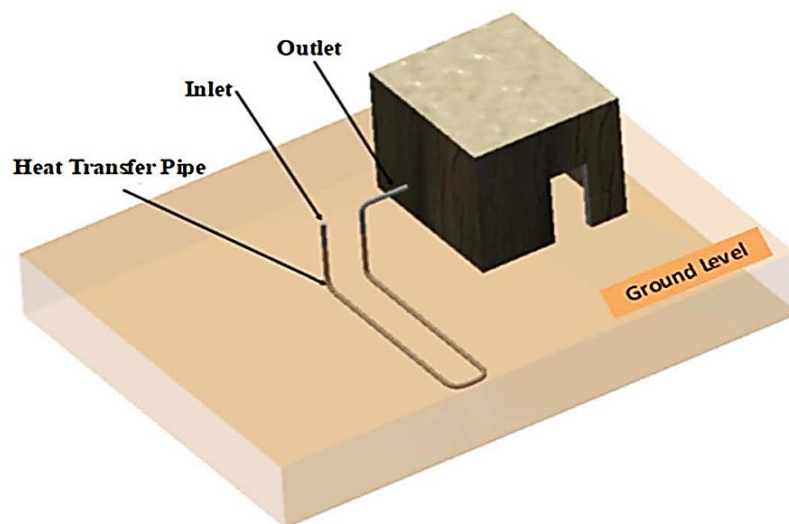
U-shaped pipe-layout for GAHE system [47]
